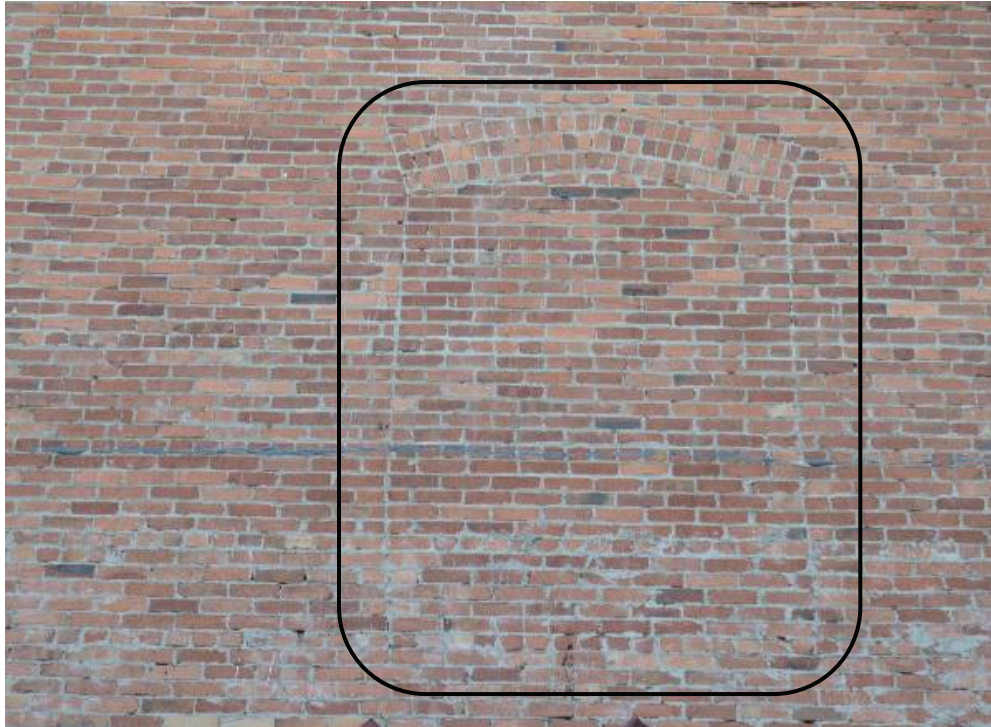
Segmental arch and mortar joints of former window openings along west façade remain visible. Looking east.
